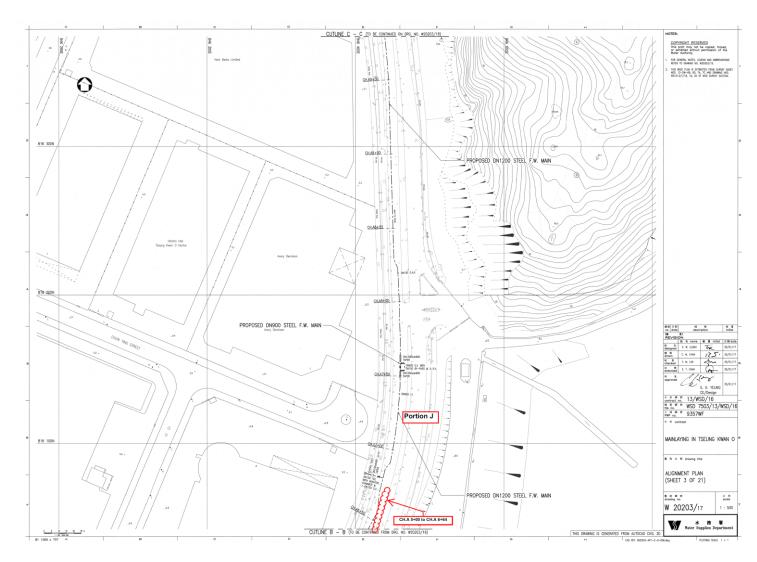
Location Plan for Portion J - CH.A 5+00 to CH.A 6+64
